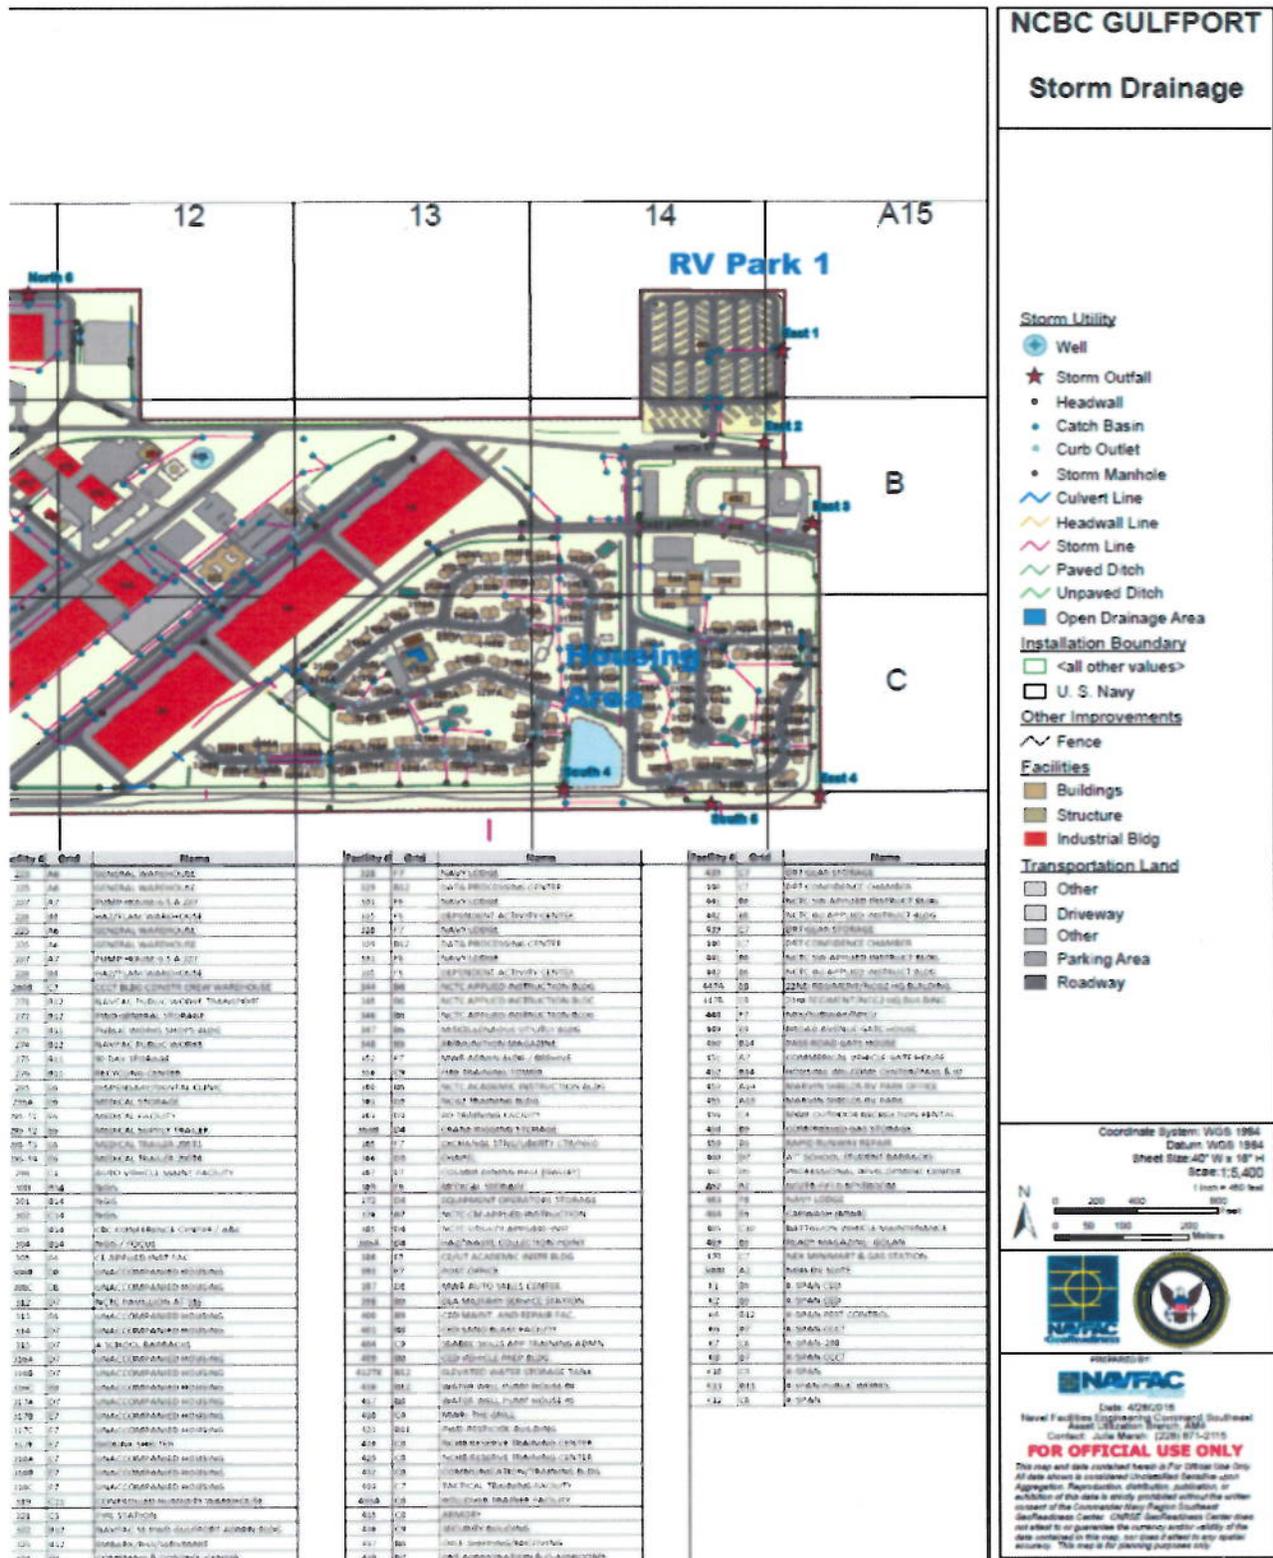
NCBC Gulfport East Side: Stormwater Outfalls and Inlet
